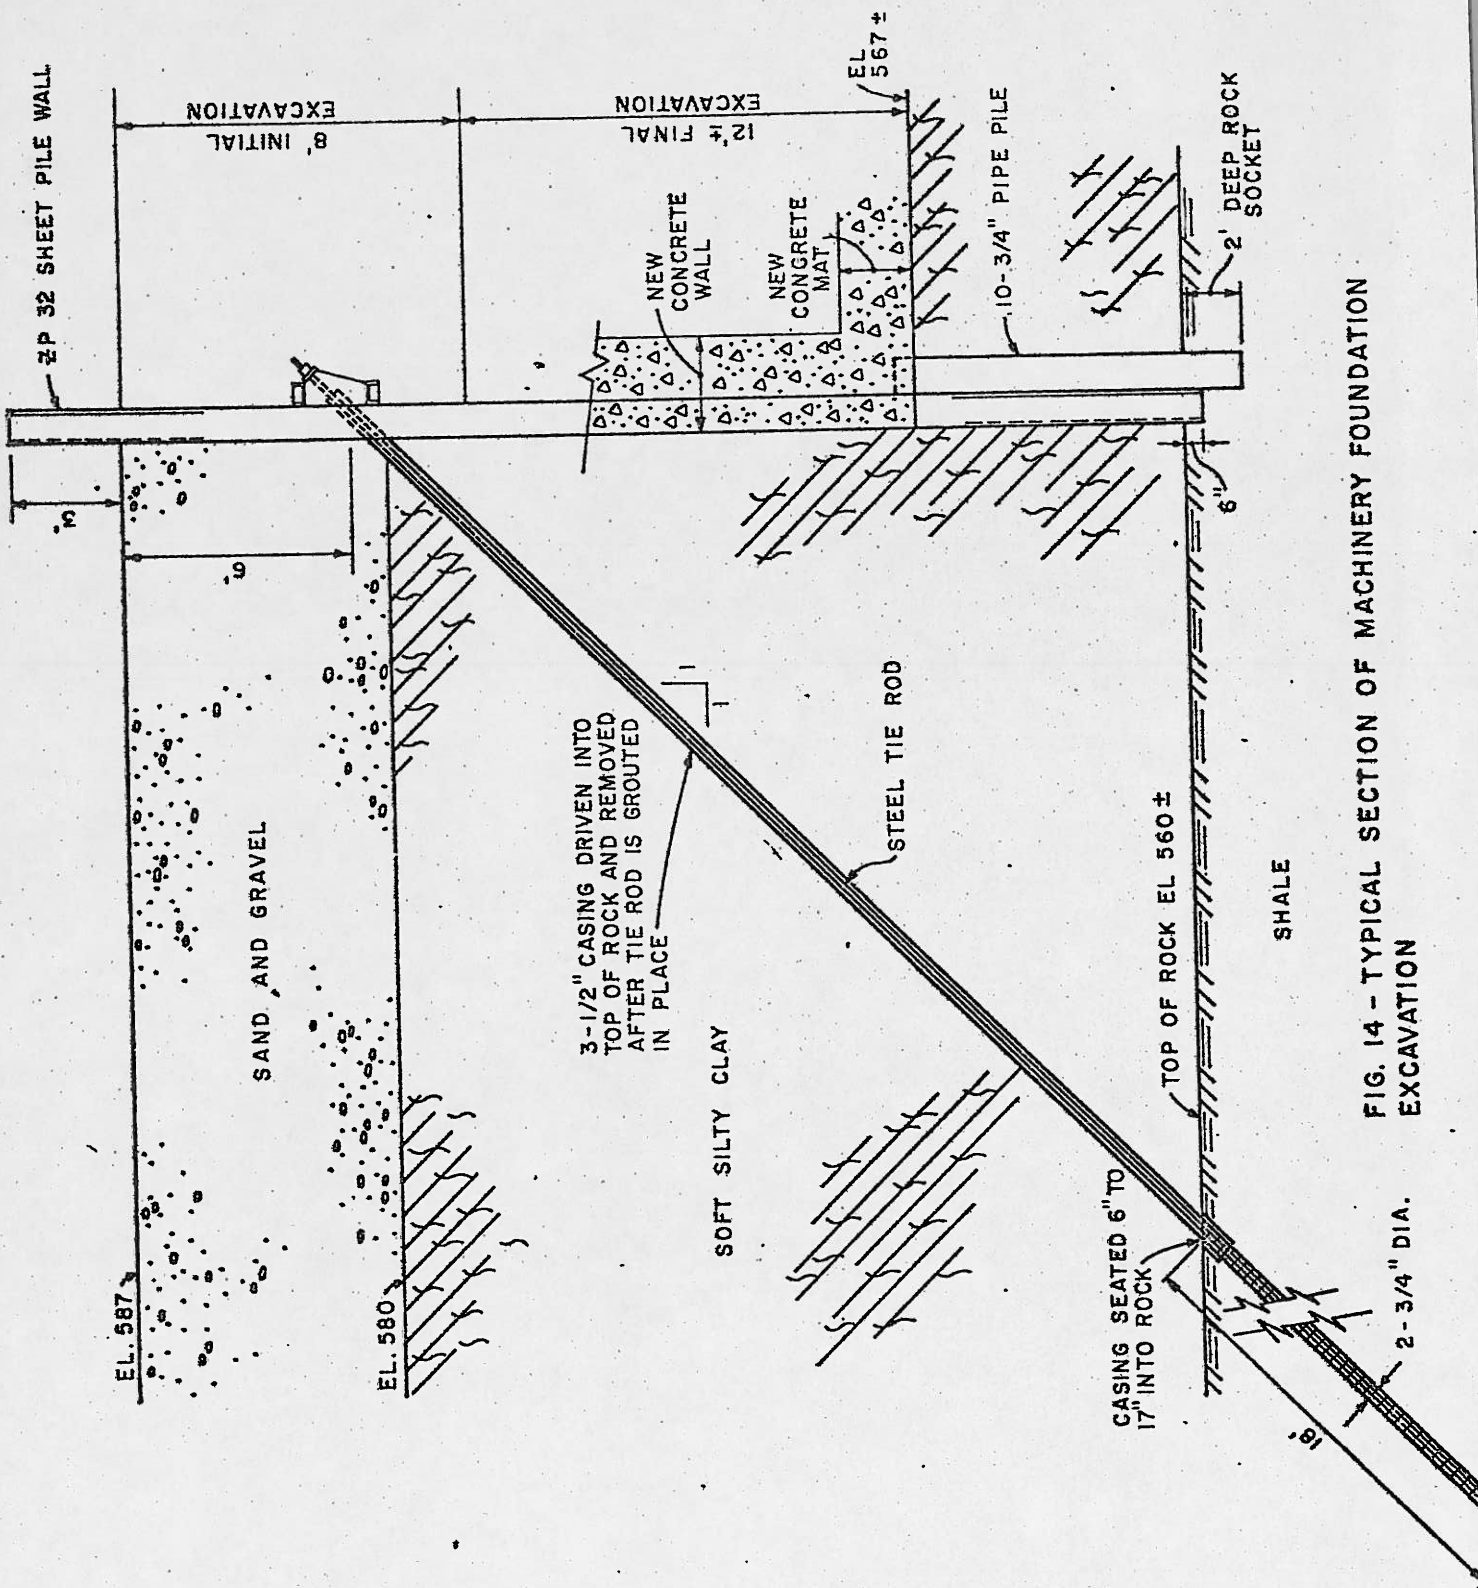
TYPICAL SECTION OF MACHINERY FOUNDATION EXCAVATION
